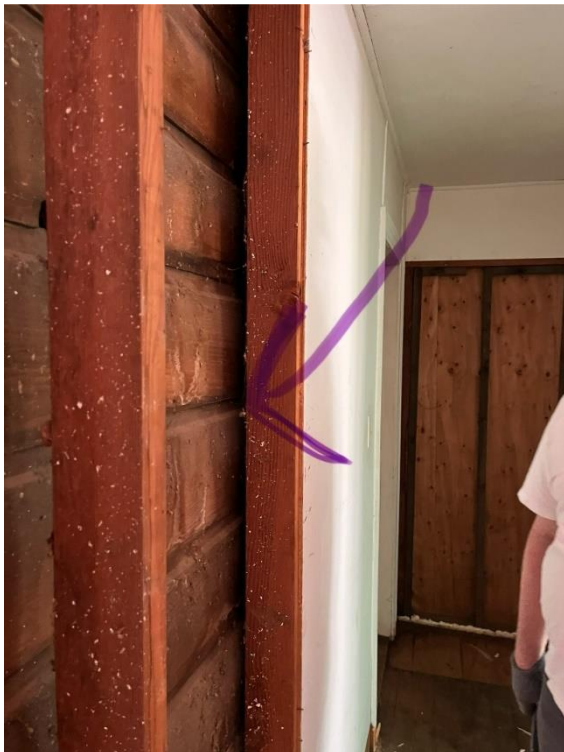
(left) – View from interior of non-historical addition to be demolished. Addition was added to primary home as a separate structure – see original siding in horizontal wood planks and separate wall built over original siding.
